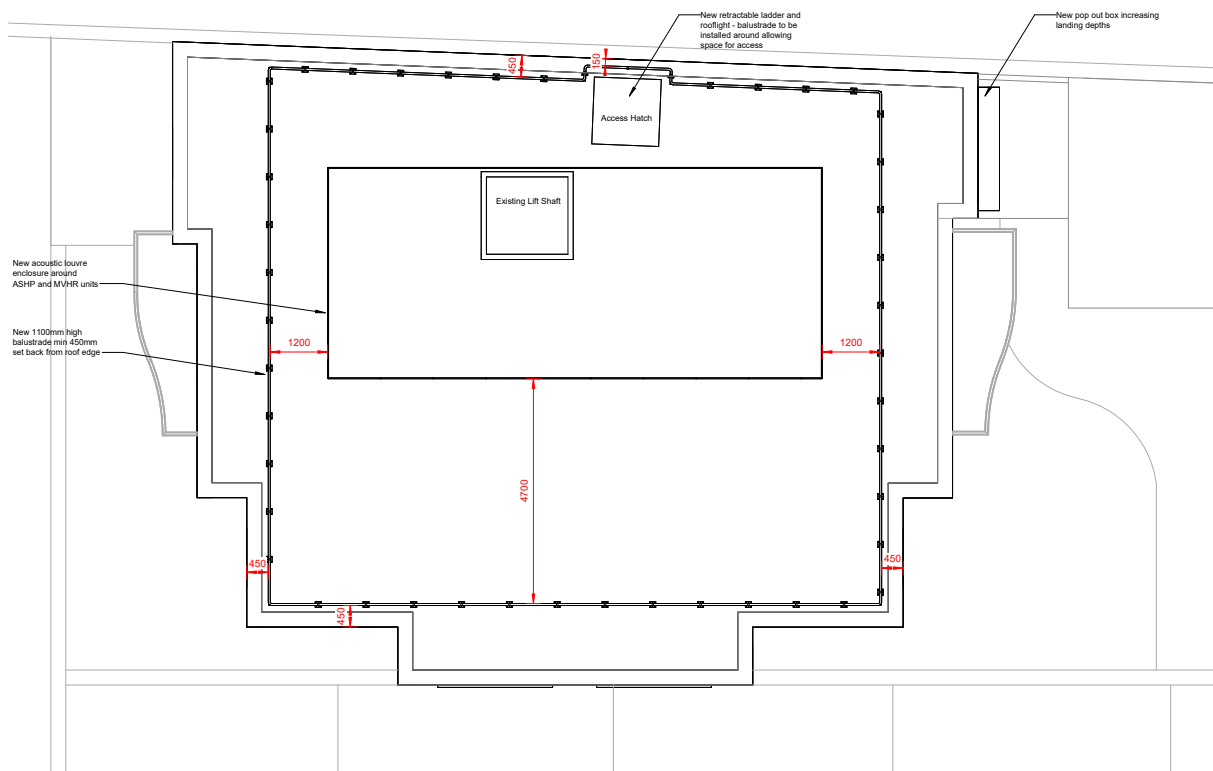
BLOCK 3 PROPOSED ROOF PLAN
